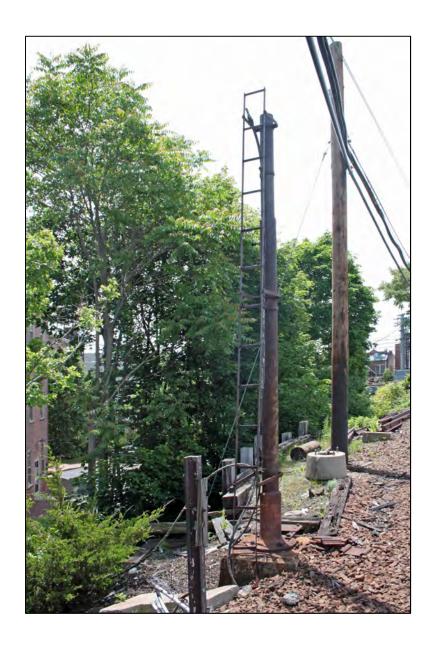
H-column-type catenary support, ca. 1958, north of I-95, camera facing southwest.
